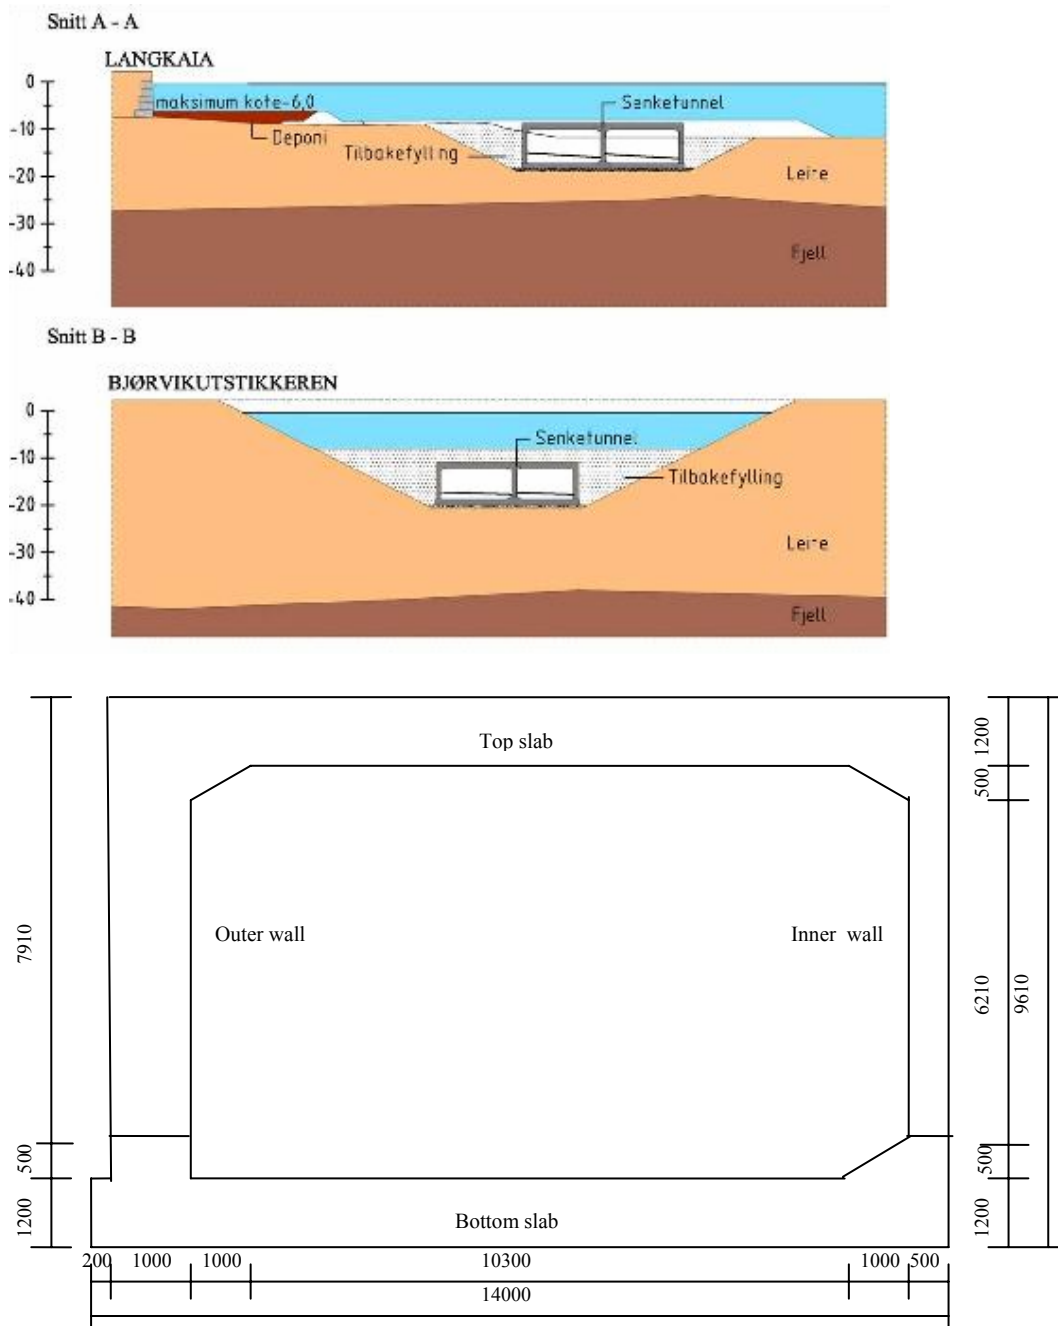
Geometry of the submerged tunnel (half of the cross section treated as symmetric).
